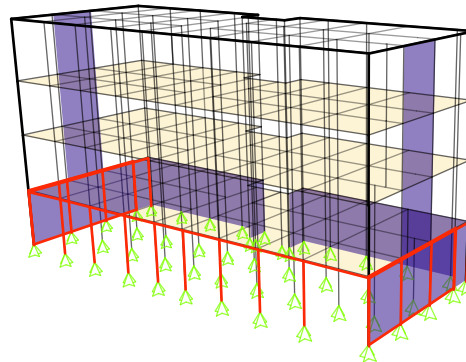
Retrofit 10: Addition of Moment Frame at Entirety of Soft-Story and Oriented Strand Board on Lateral Walls.
